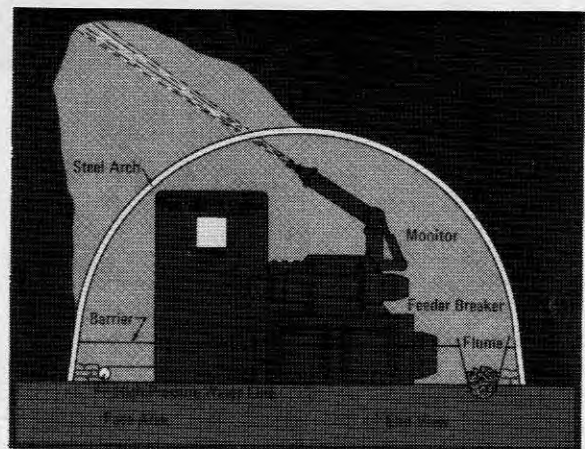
Another plan view of the face area at the hydraulic mine.
